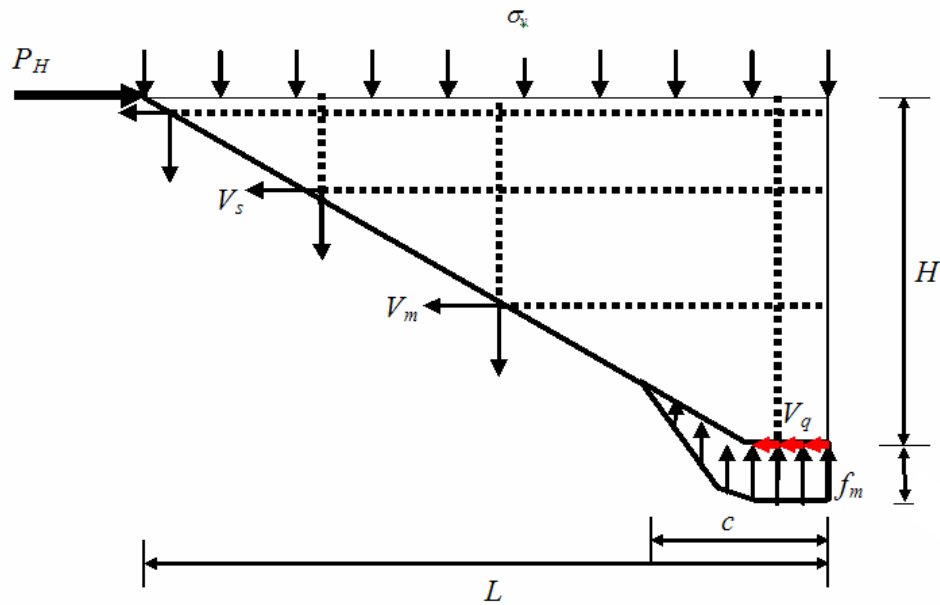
Diagonally cracked WSRM shear wall (Shing et al. (1993a))
